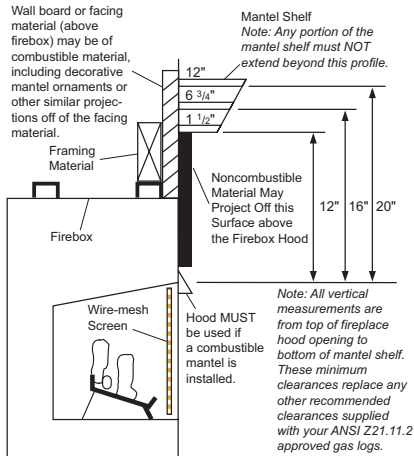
Minimum Mantel Clearances for Built-In Installation
